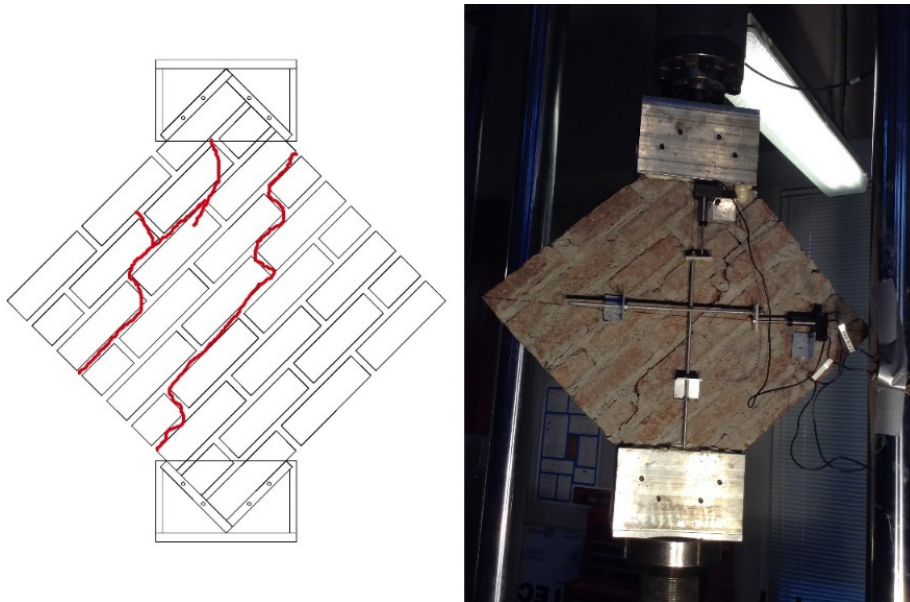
Behavior of masonry wall produced using SCEB 7 blocks under diagonal compression. Crack patterns show classical failure through mortar joint.
